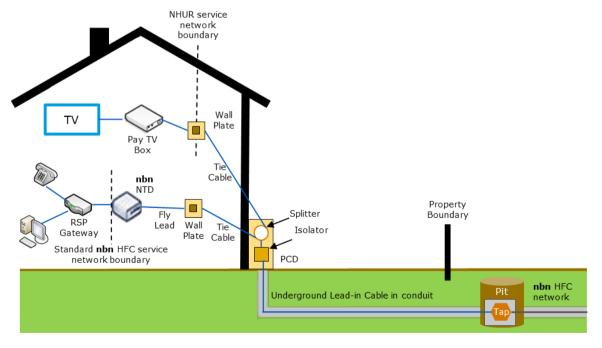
SDU nbn HFC installation - underground TAP with underground lead-in cable
